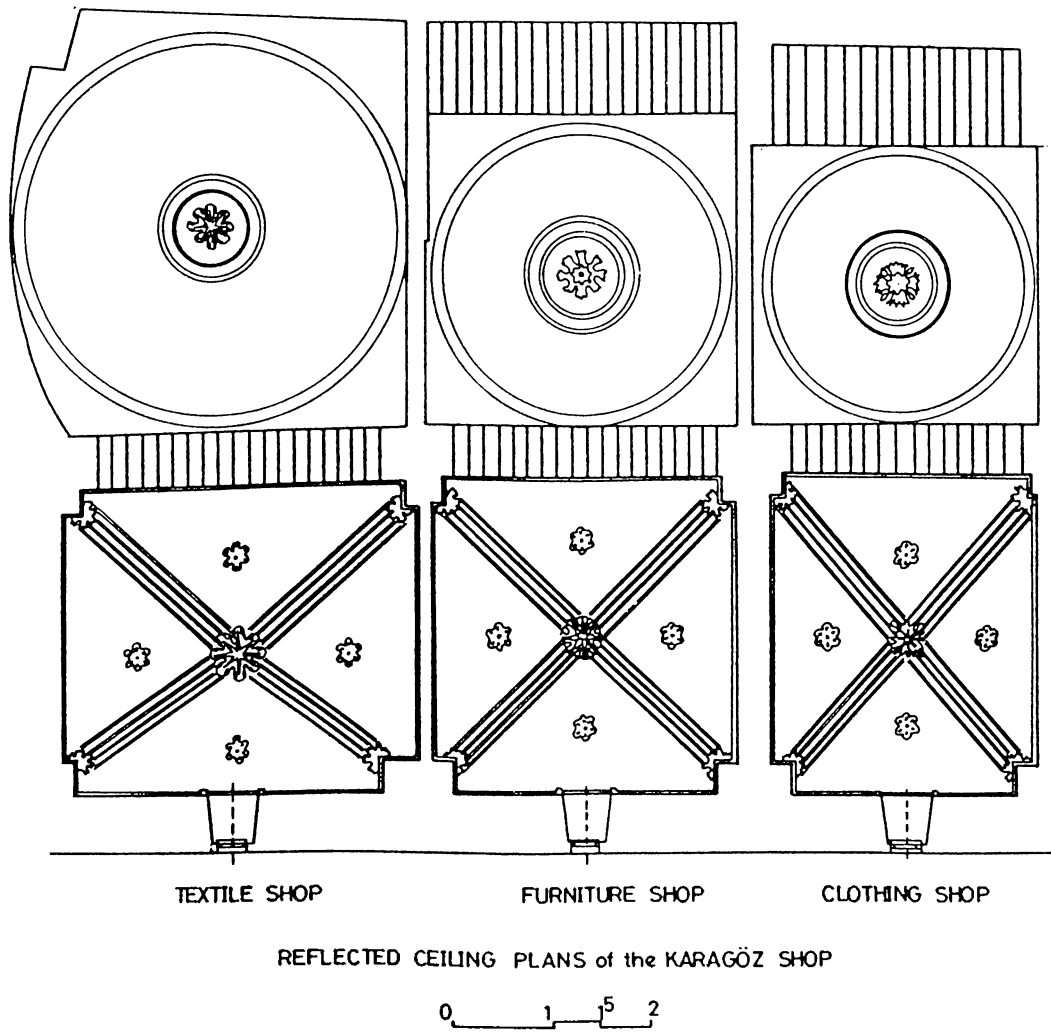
Reflected ceiling plans of the *Karagöz Shops
